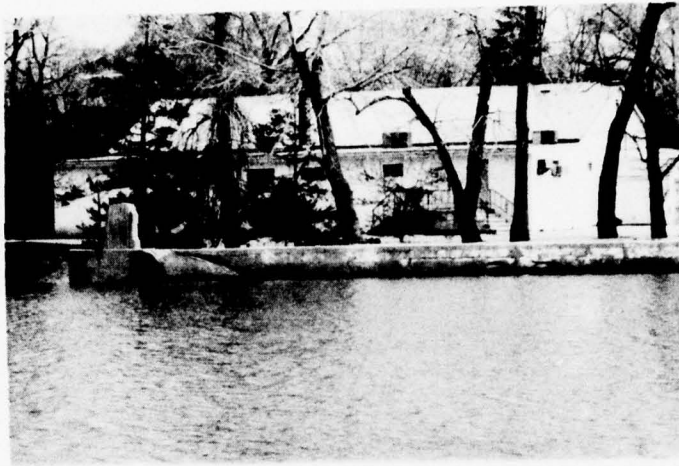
View of the upstream reservoir rim wall on the right abutment
